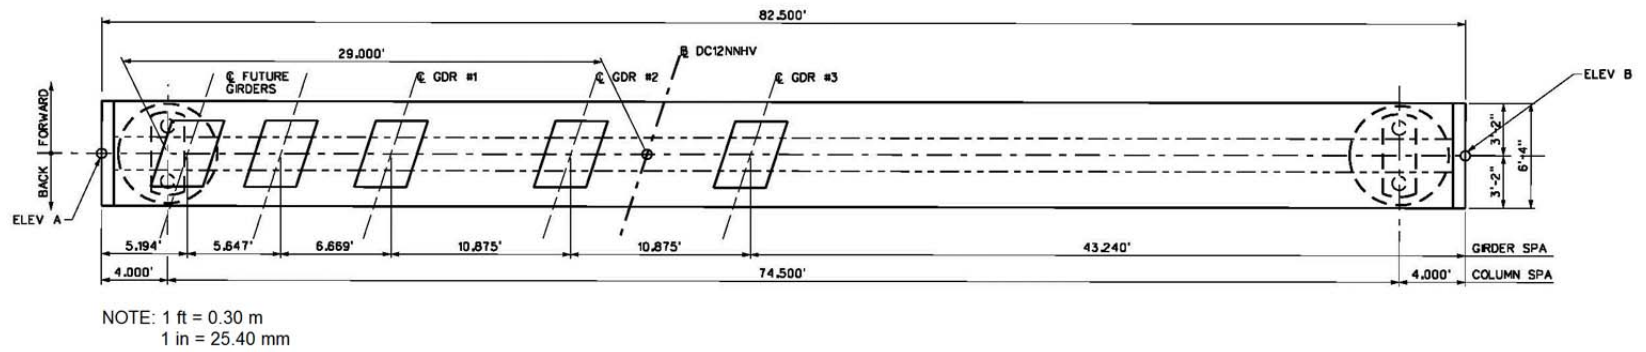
Plan View Geometry of Post-Tensioned Concrete Cap
